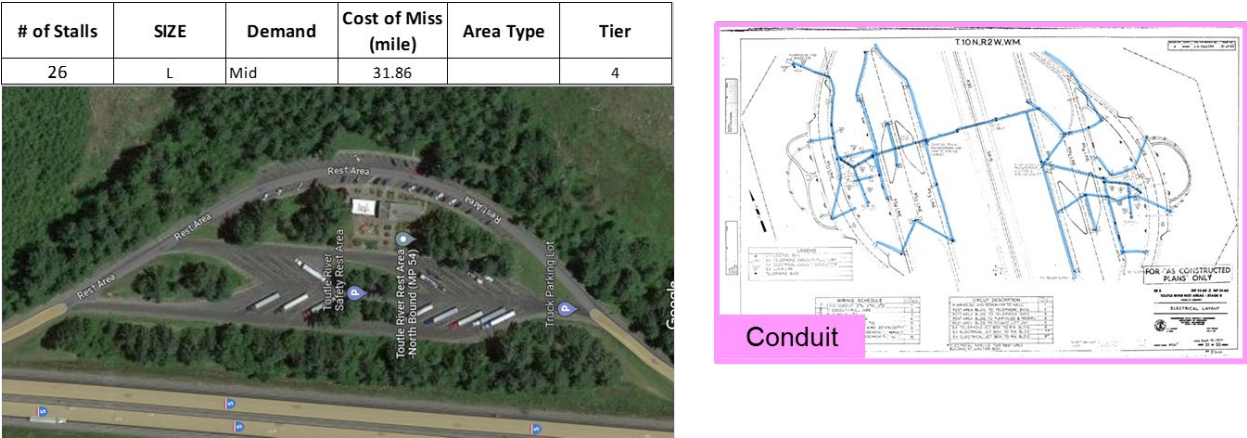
Proposed site for the pilot study: Toutle River NB.
